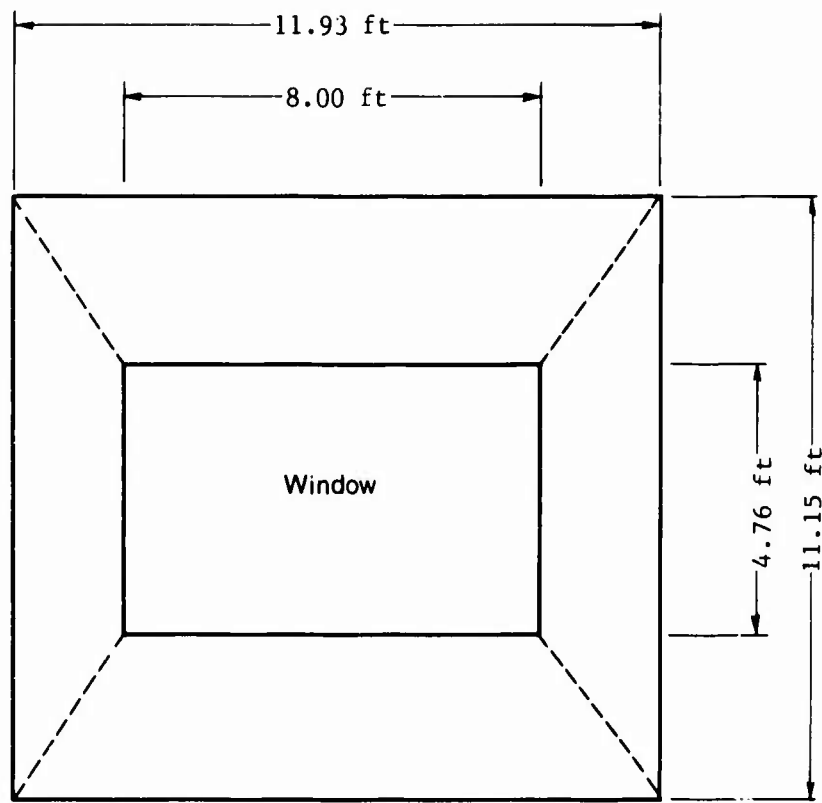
Assumed Failure Pattern of Typical Wall, South Elevation, Landis Hospital.
